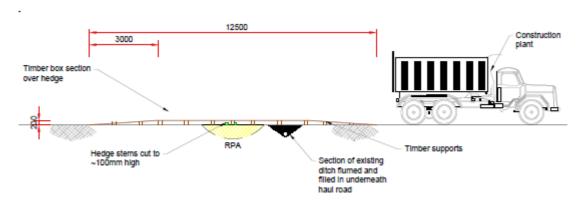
Indicative Section showing temporary timber and boarding to bridge over cut hedge stems
